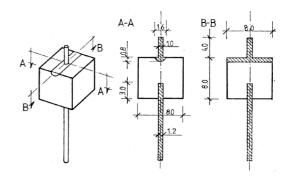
Specimens for testing natural adhesion of plain bars to concrete (dimensions in cm)
